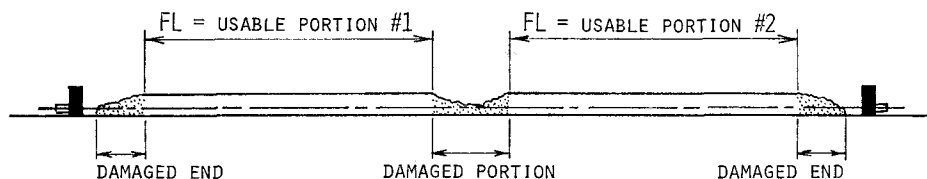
Longitudinal section through extruded slab with two usable (uncut) portions of concrete.
